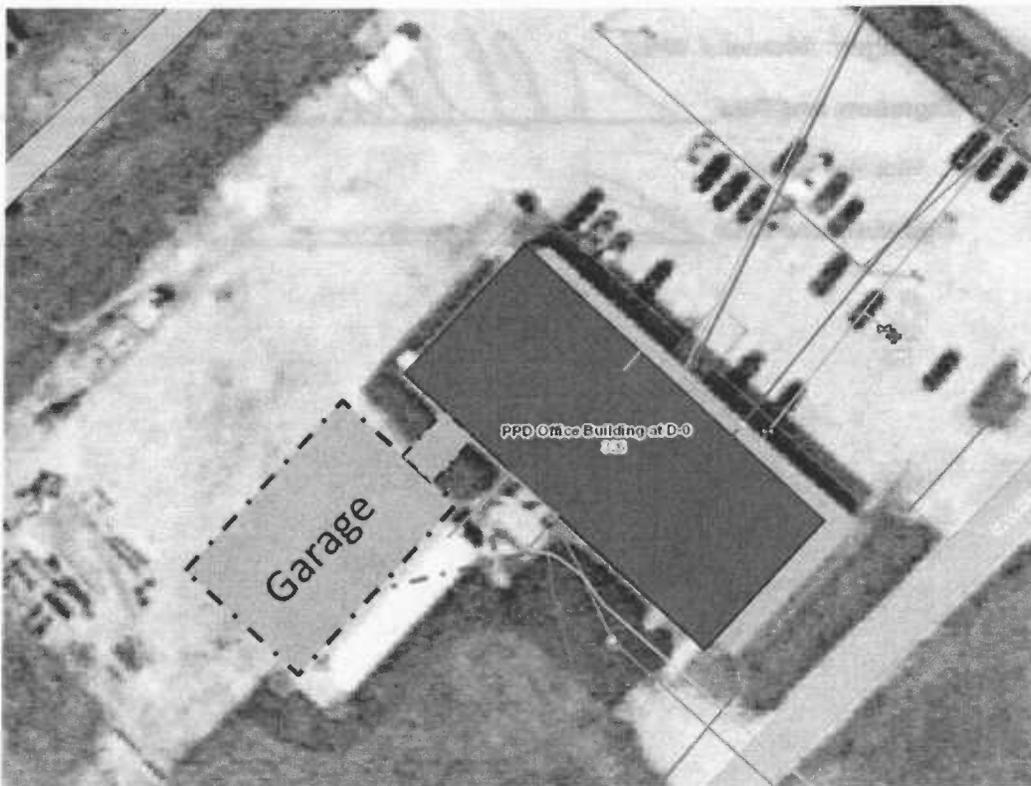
Existing Utilities. Electric (red) will have to be connected to the building (complete legend on next page).
